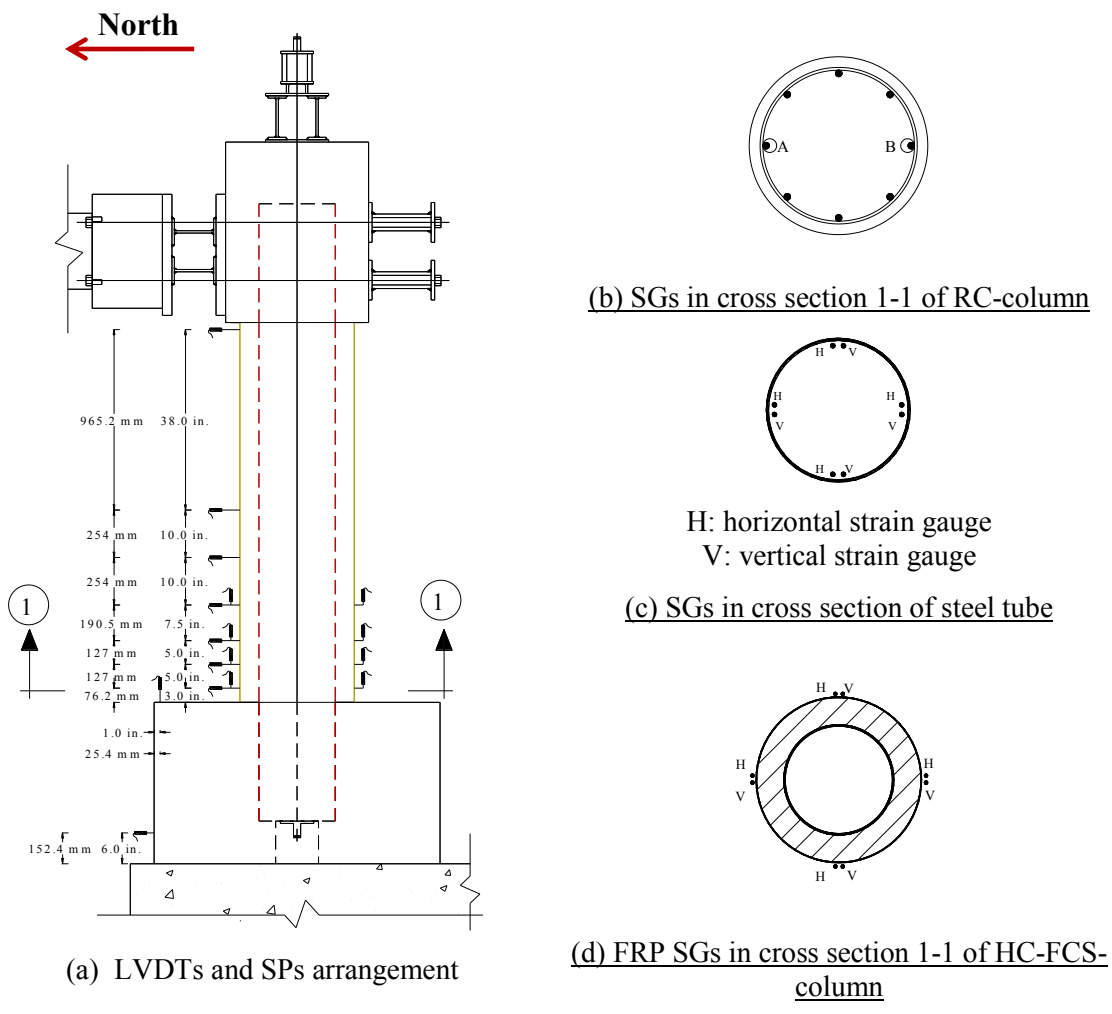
Layout of the LVDTs, SPs, and strain gauges
